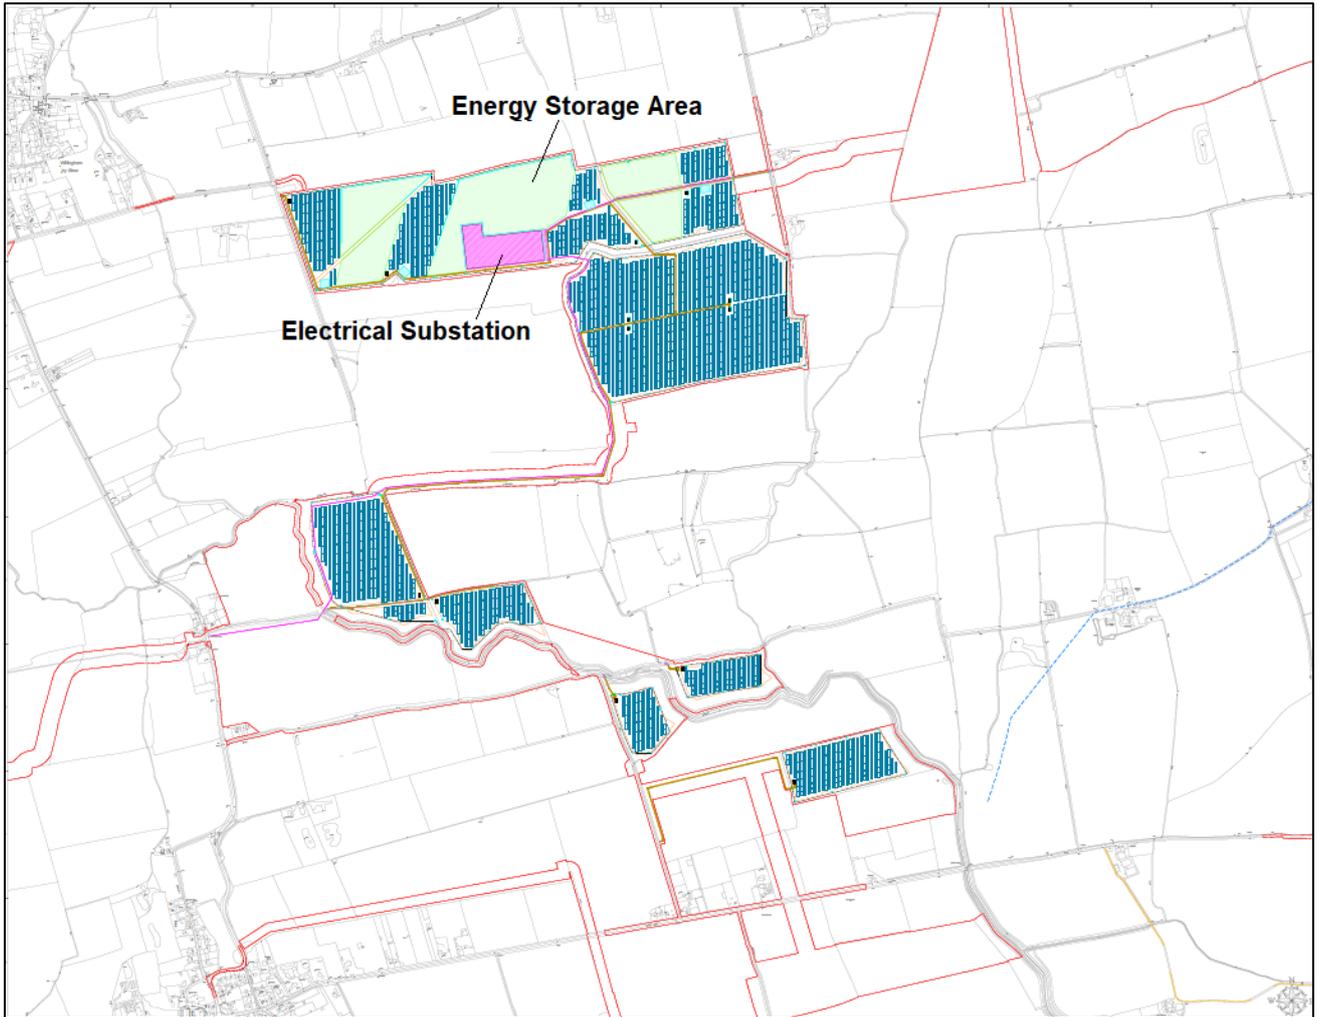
BESS Site Layout Plan – Cottam 1 West B
